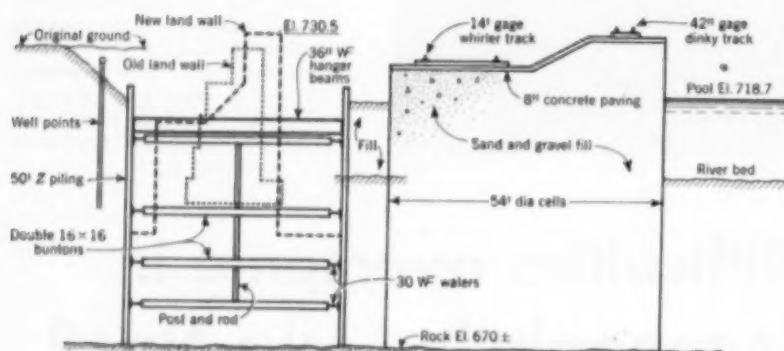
Section through subcofferdam looking upstream shows bracing of buntions to provide wide working spaces. In photo, below, land side of subcofferdam is to right.
